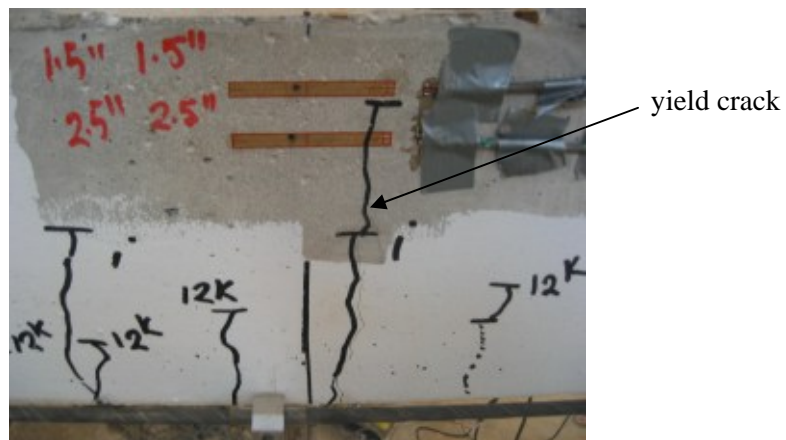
Yield crack in the overloaded beam compared to the adjacent cracks
